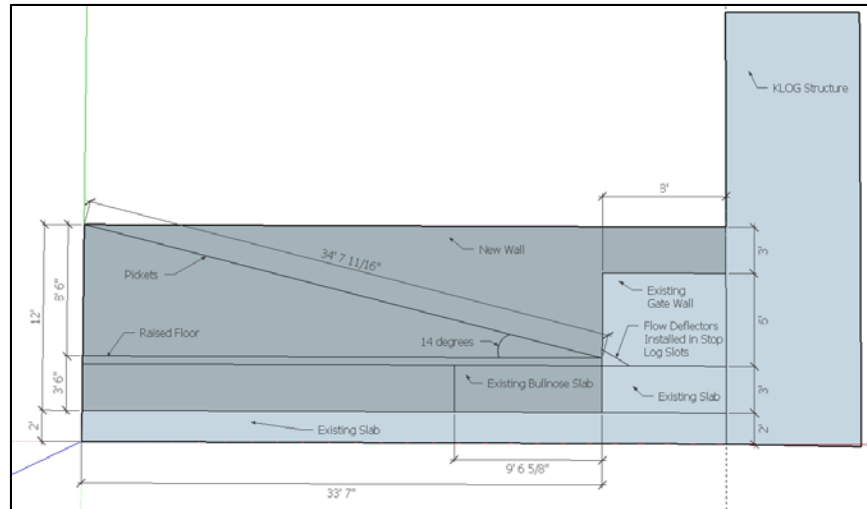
Side view and dimensions of features on the downstream side of KLOG with raised side walls, a raised floor, the concrete bullnose remaining, and a picket weir at the base of the existing gate walls.
